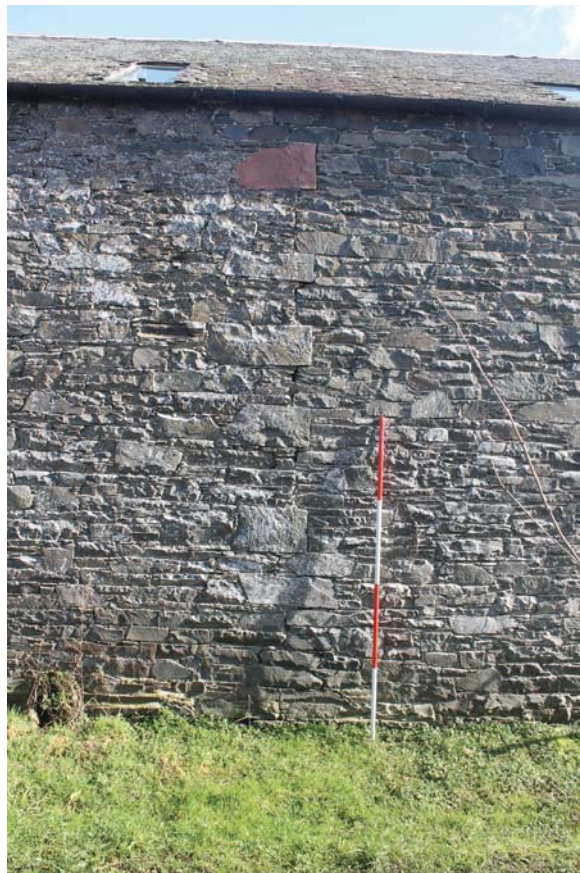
Barn A1, west elevation to the south side, detail of stonework from the west (?a phase line)
